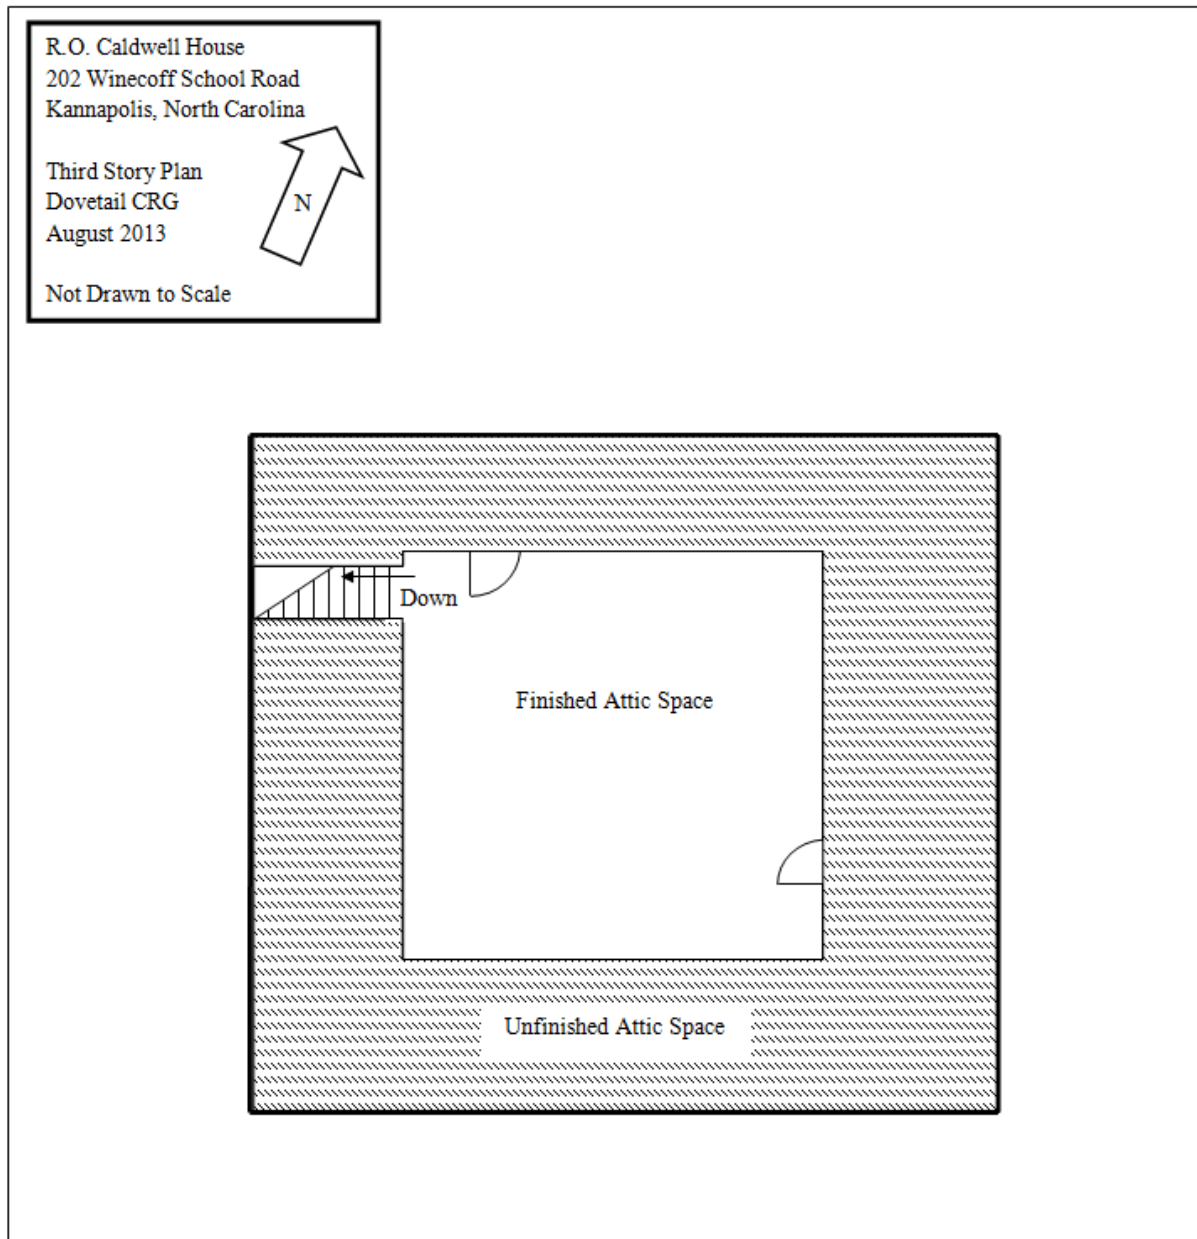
Third Story Plan of the R.O. Caldwell House (CA 423).
